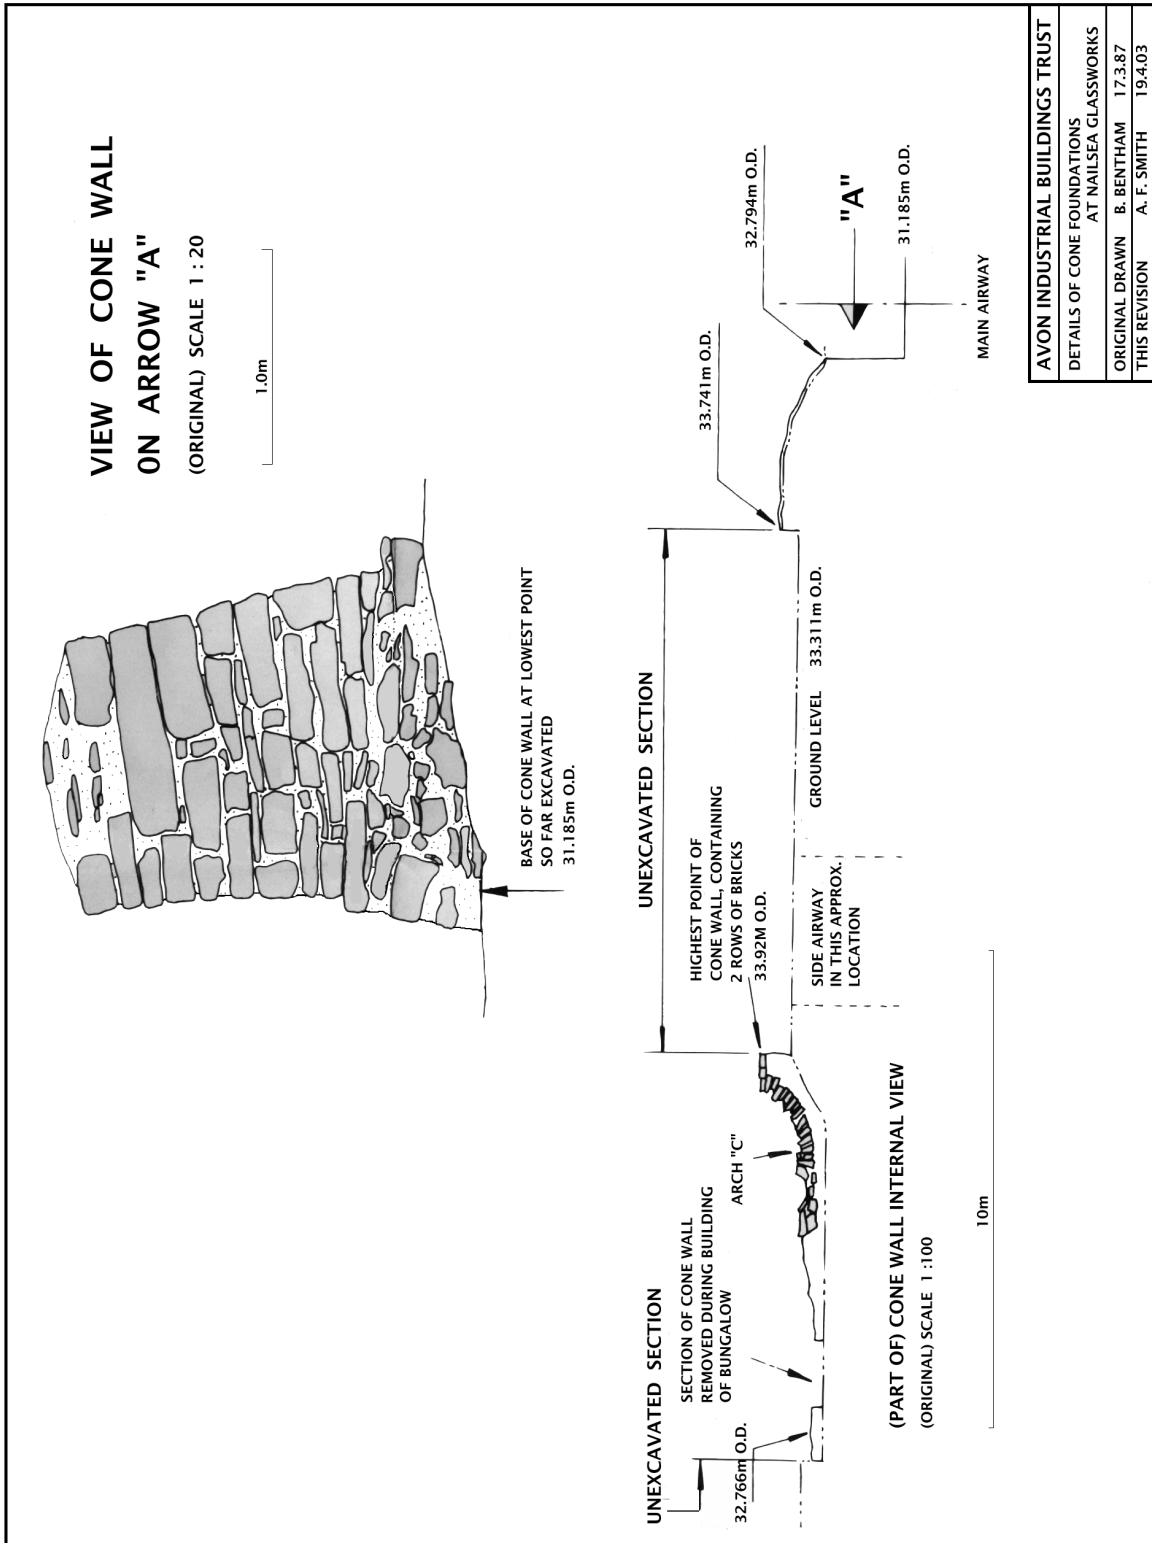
Extract from “Details of Cone Foundations at Nailsea Glassworks”
